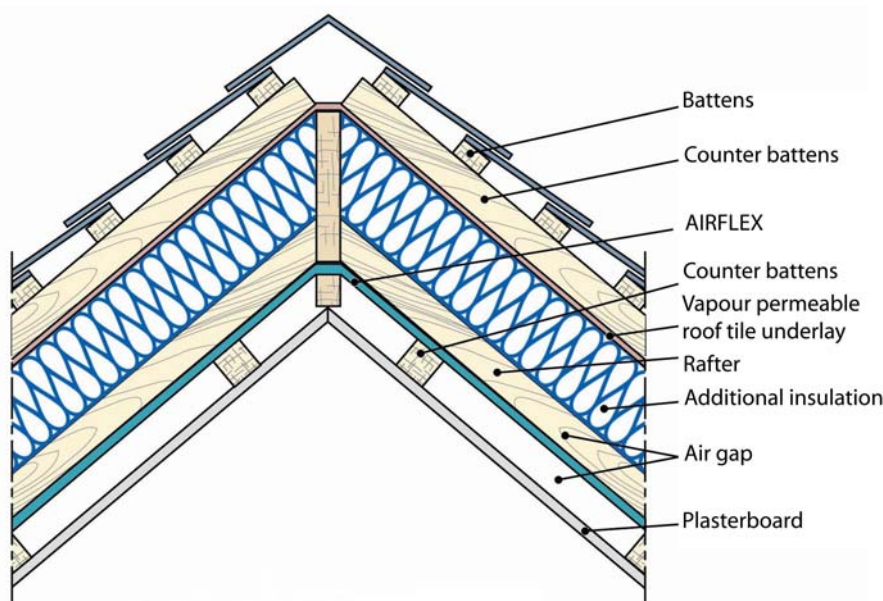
Application of Airflex with additional insulation - Ridge Detail
